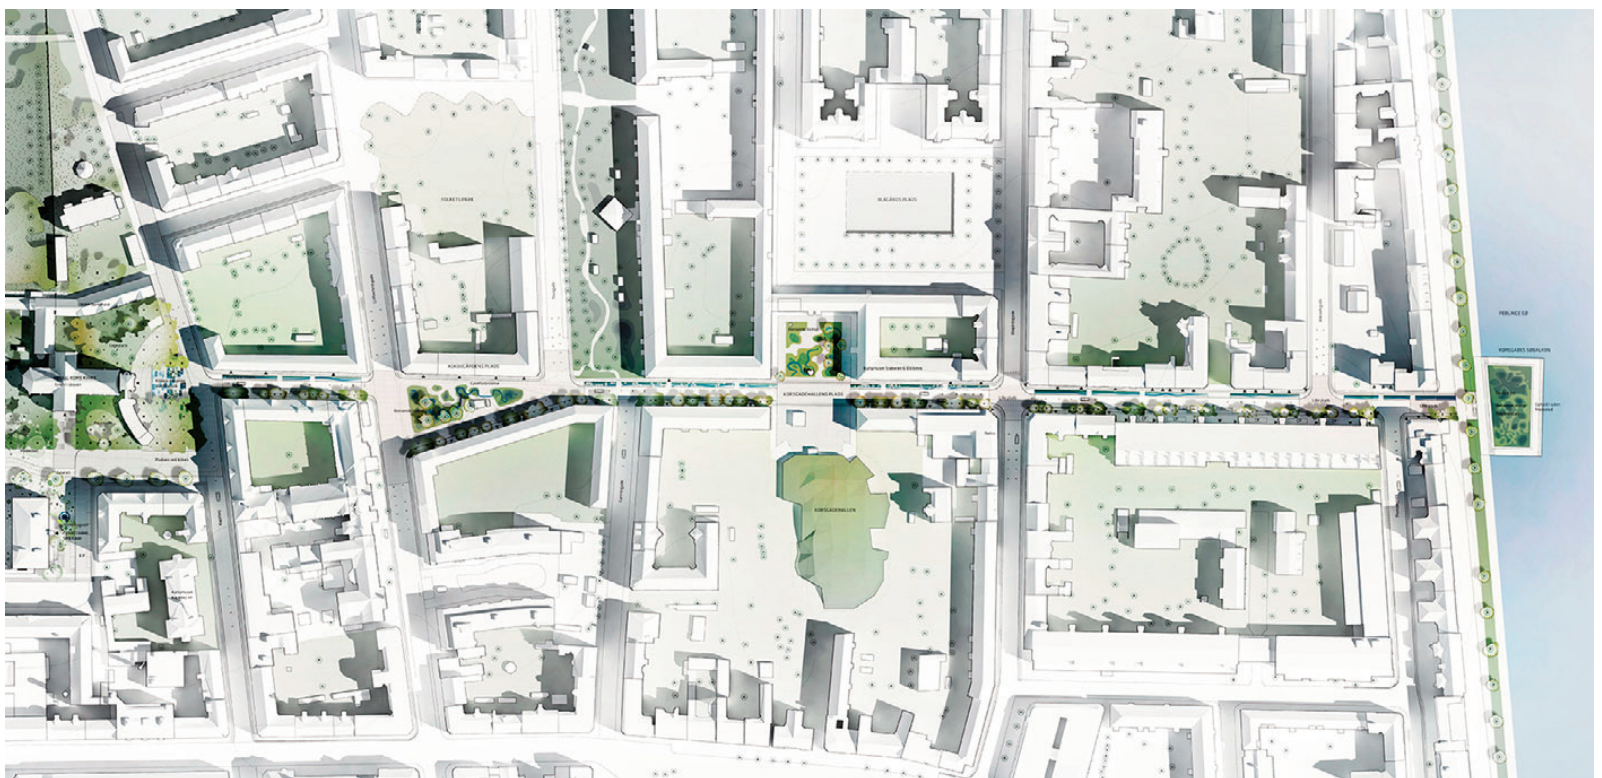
| Korskgade Street Plan (source: SLA studio).
